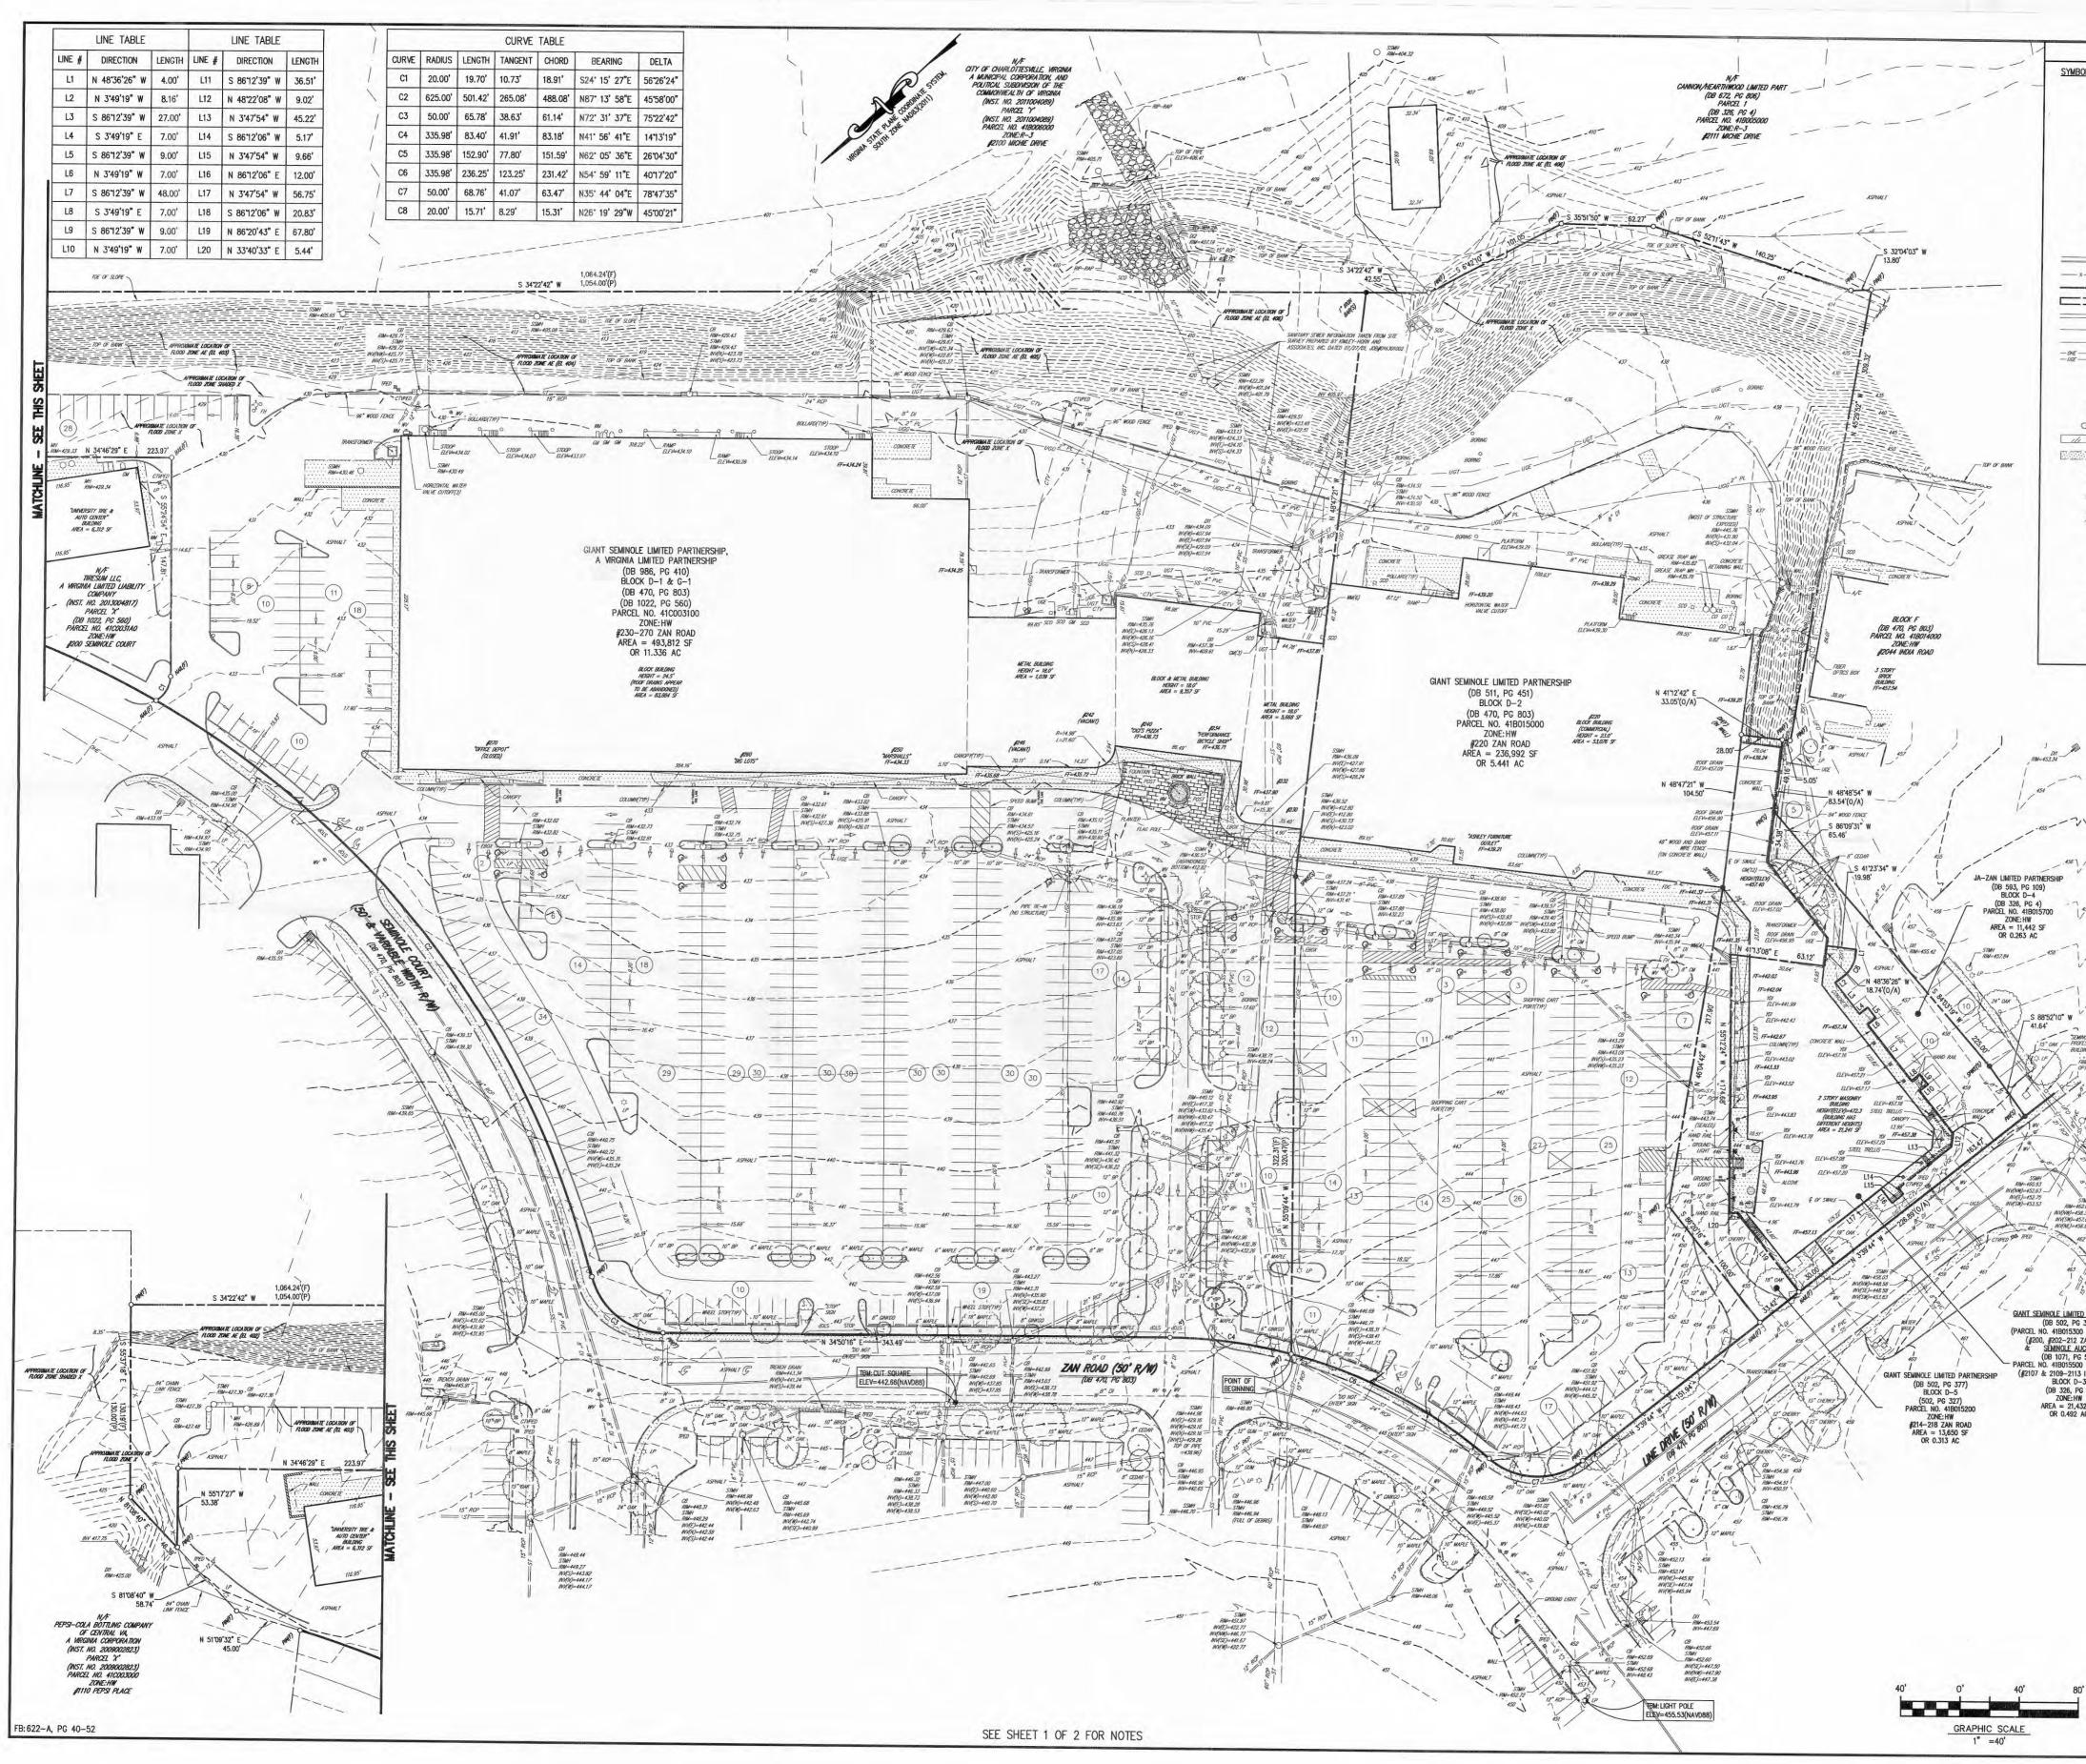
Survey of Existing Property Exhibit 2: Site Plan Exhibit 3: Steep Slope Disturbance Exhibit 4: Existing Pond Report
